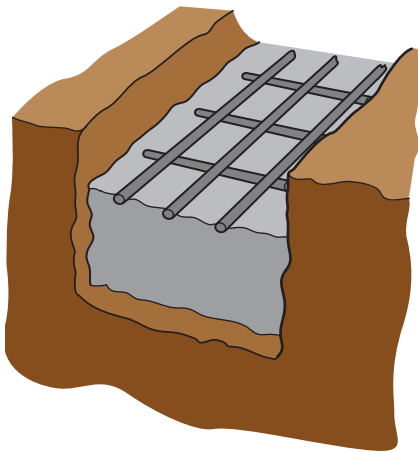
Long bars on top when steel mesh is laid in the upper part of foundation concrete
